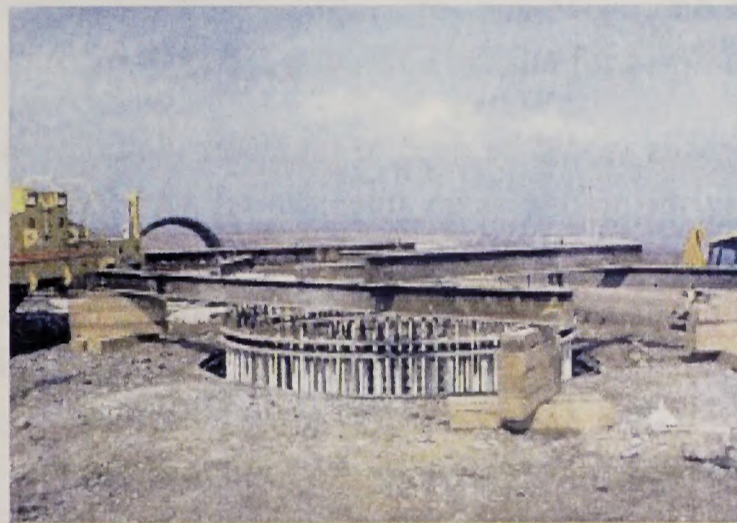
Foundation Bolts Ready for Concrete Pour.
